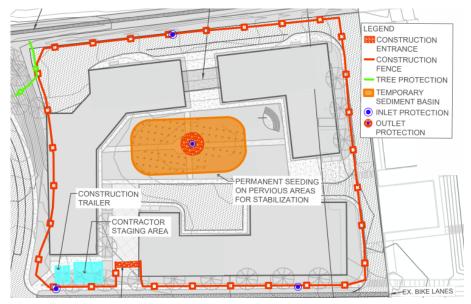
Phase II of the ESC plan. Bioretention serves as the sediment basin.
